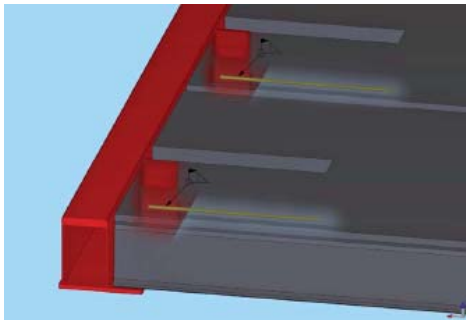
Principle connection of deck elements with one sided HSQ steel beam.
